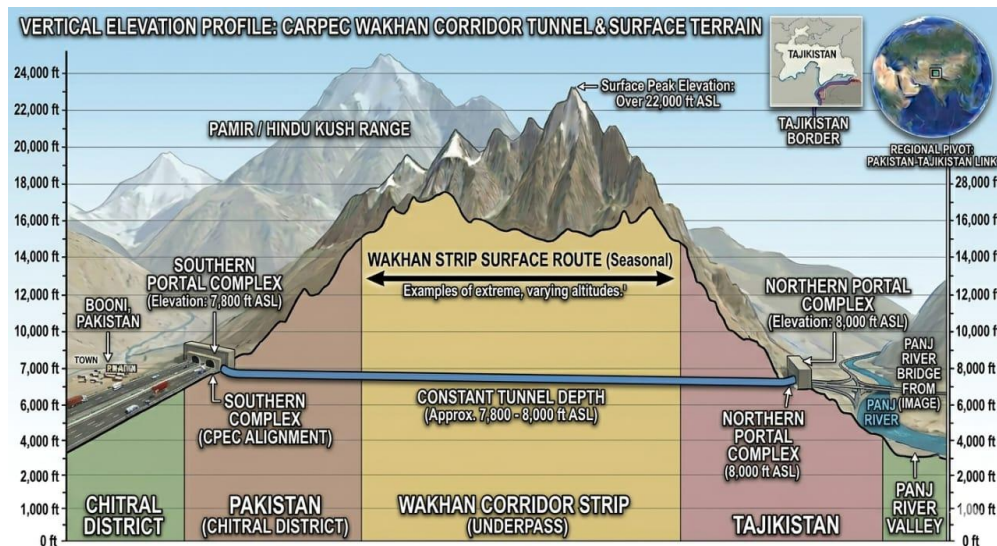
Vertical Elevation Profile of the Proposed Wakhan Tunnel Corridor
